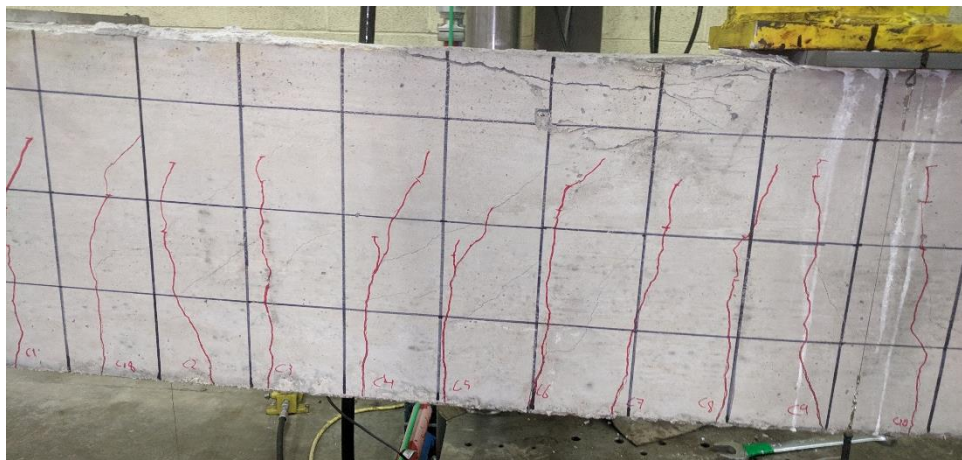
BM 6.5-90: Crack patterns at failure
